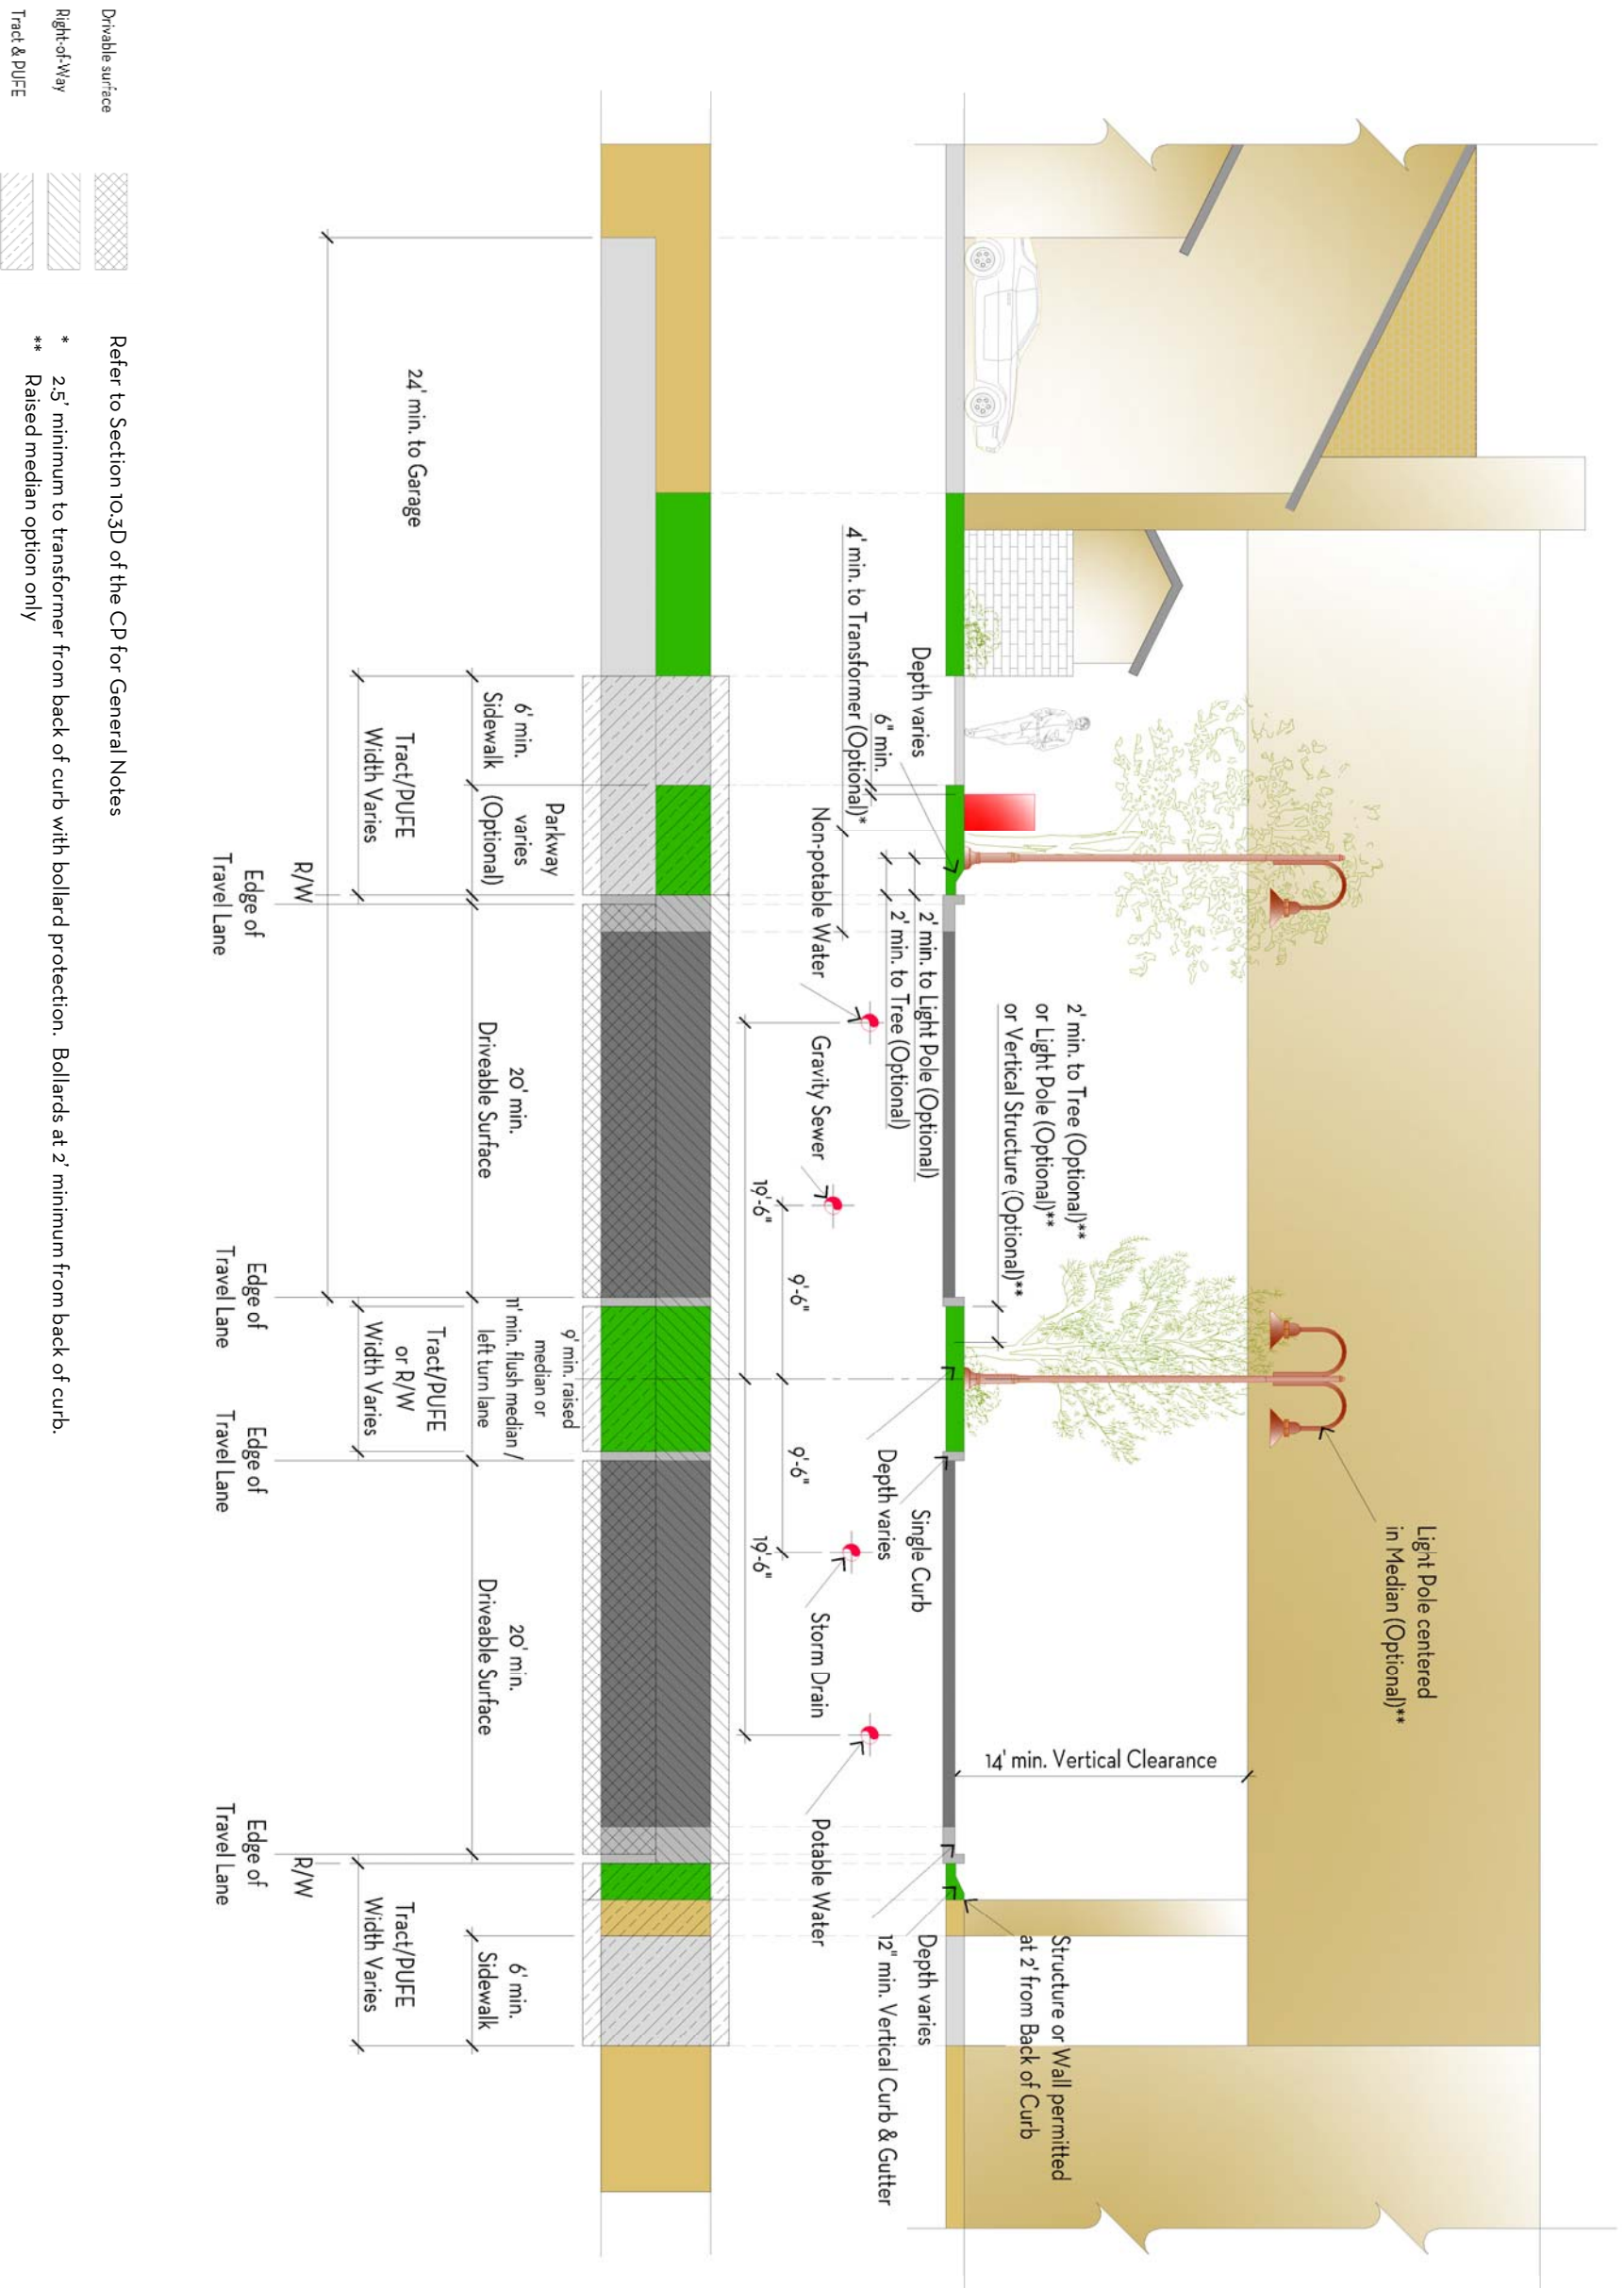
Two-Way Four Lane District Street - Detailed Cross Section
